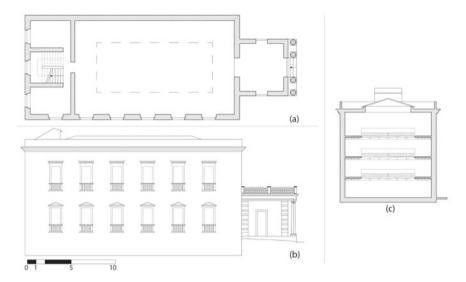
Villa Di Negro: a plan; b facade; c section (Drawing: A. Meloni)
